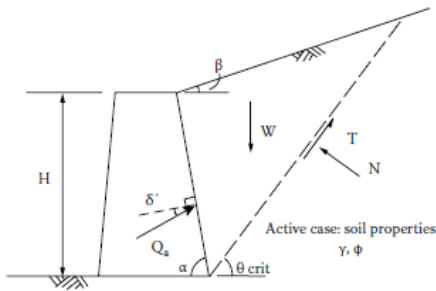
Force diagram Müller-Breslau: frictional soil, wall friction, backfill slope and slope soil-wall interface [16]
